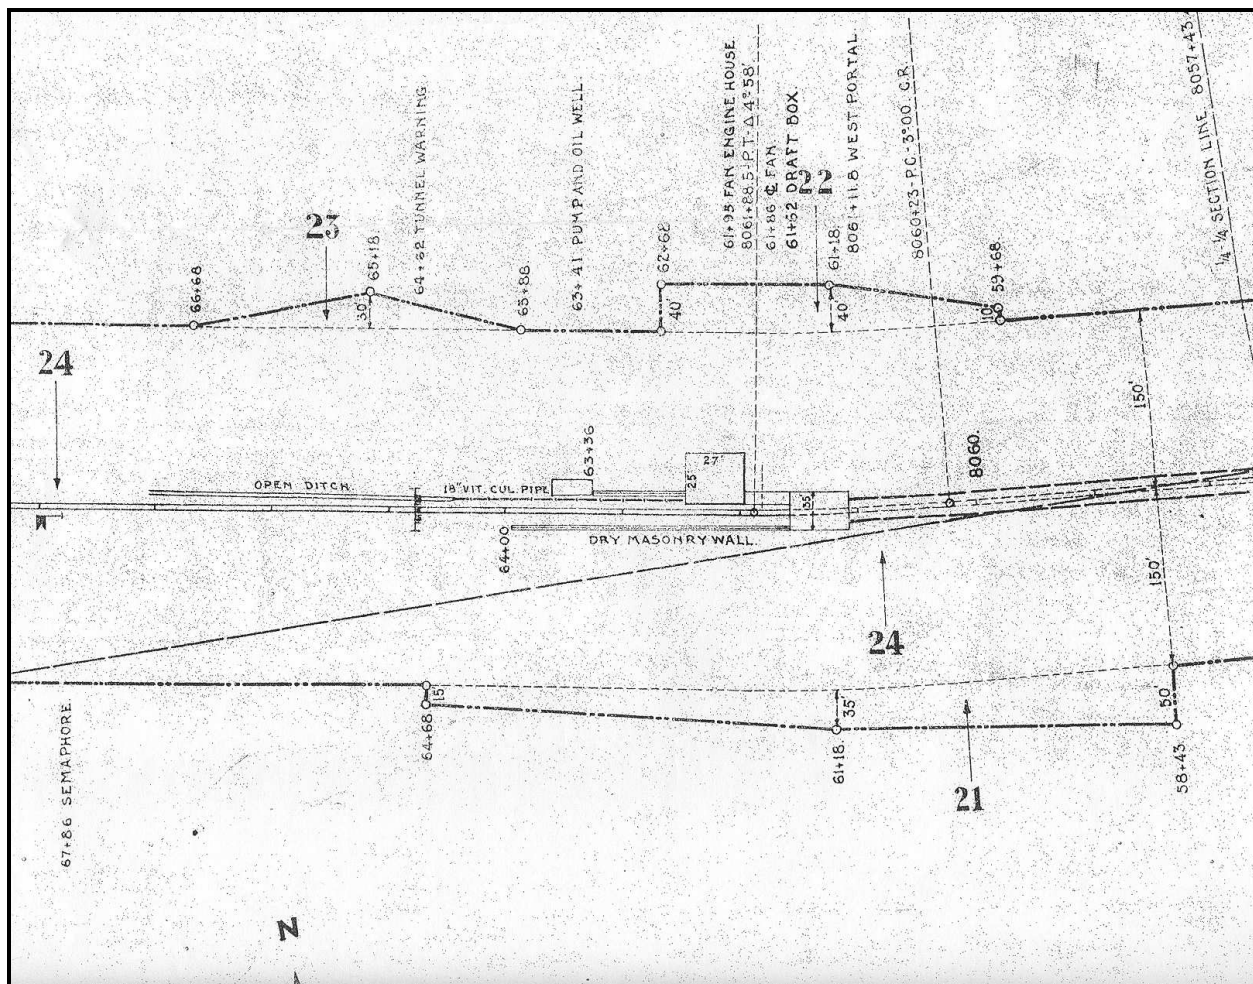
Detail from a 1916 Chicago Great Western station map, showing the ventilation station at Winston Tunnel. Buildings and structural features are indicated in the margins (Chicago Great Western 1916).
